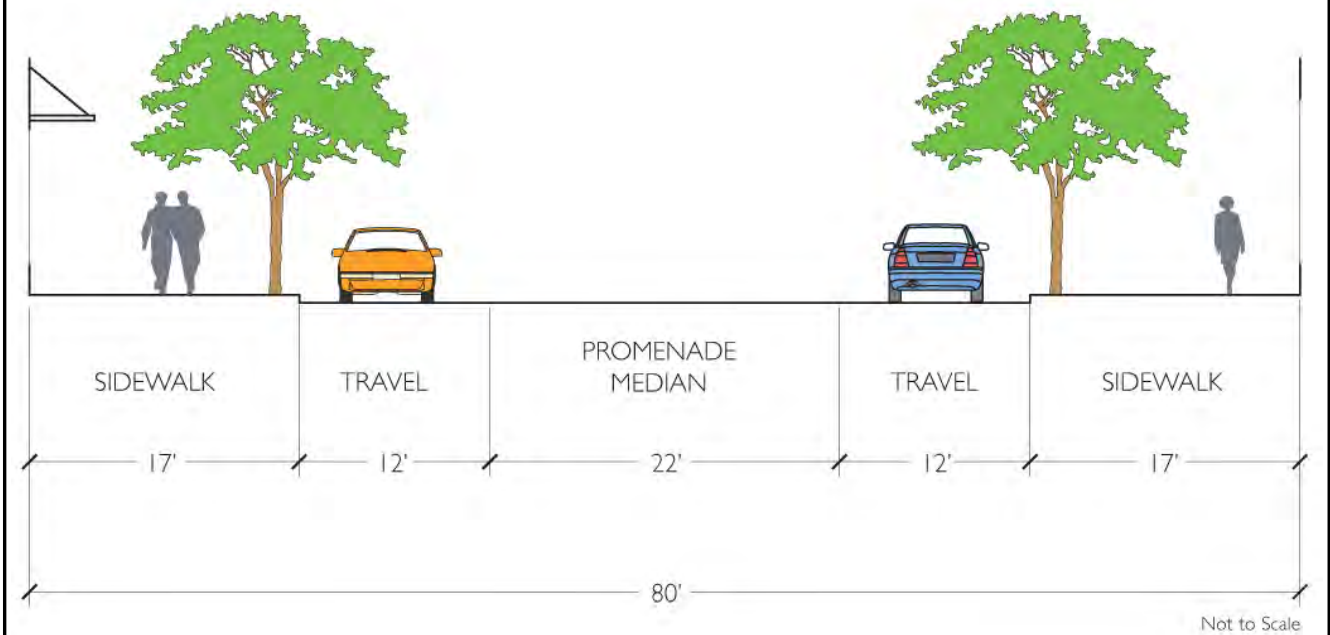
Typical West Broadway Avenue Section Between Hillsdale and Alhambra (for illustrative purposes only)
